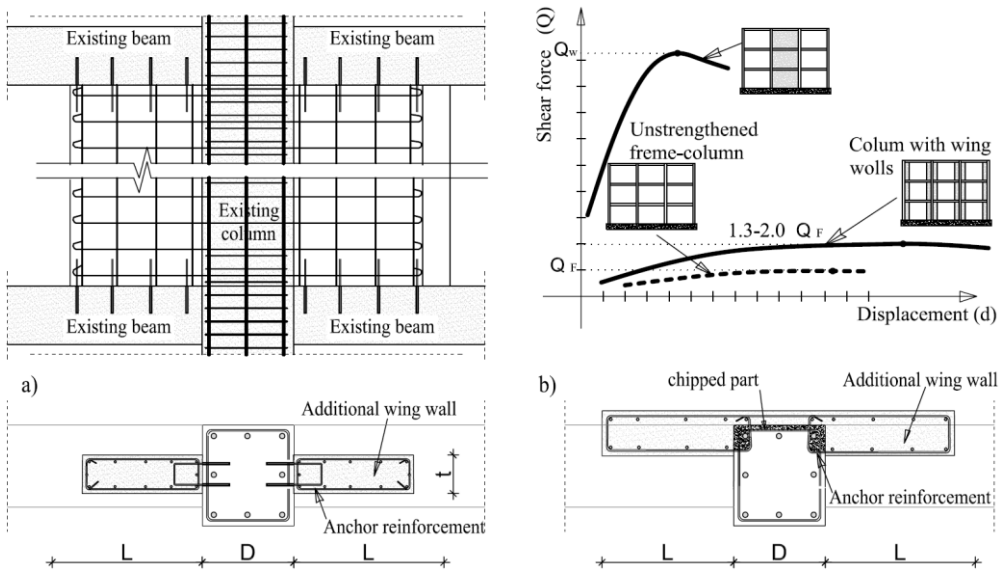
Wing wall with discontinuous and continuous vertical reinforcement
